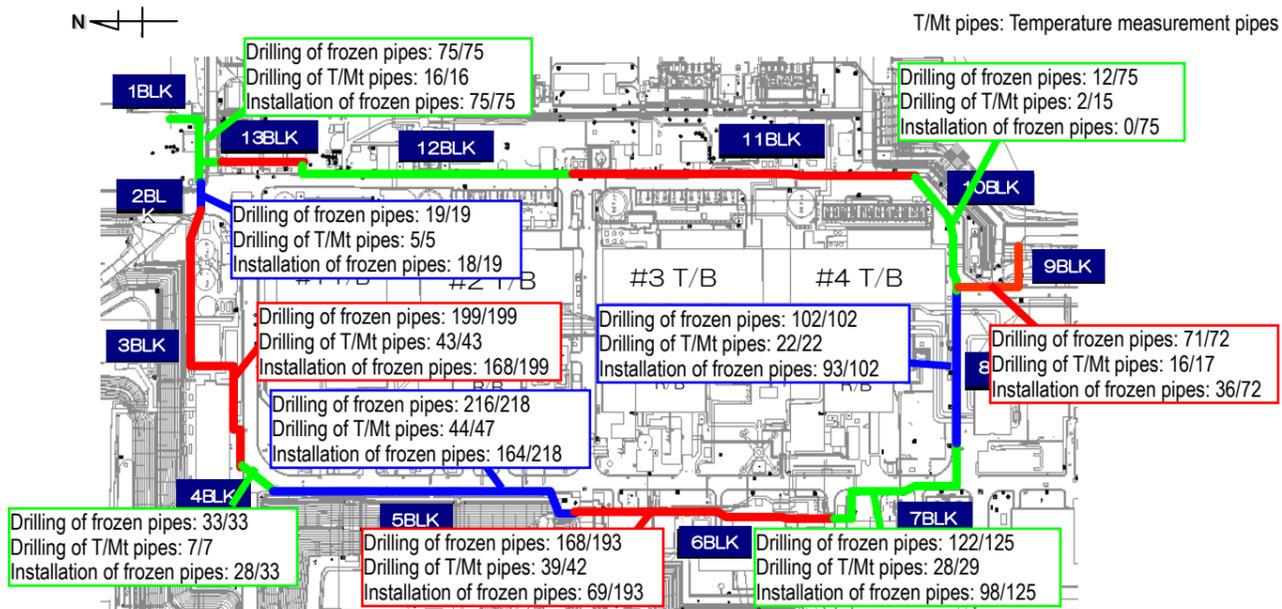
Drilling status for frozen-soil impermeable walls and installation of frozen pipes
